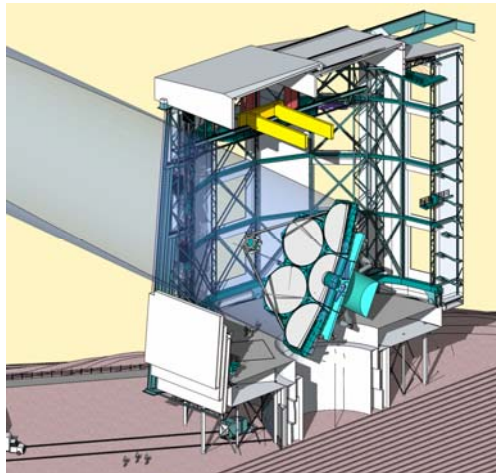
Enclosure w/ shutter doors open, overhead crane deployed.
